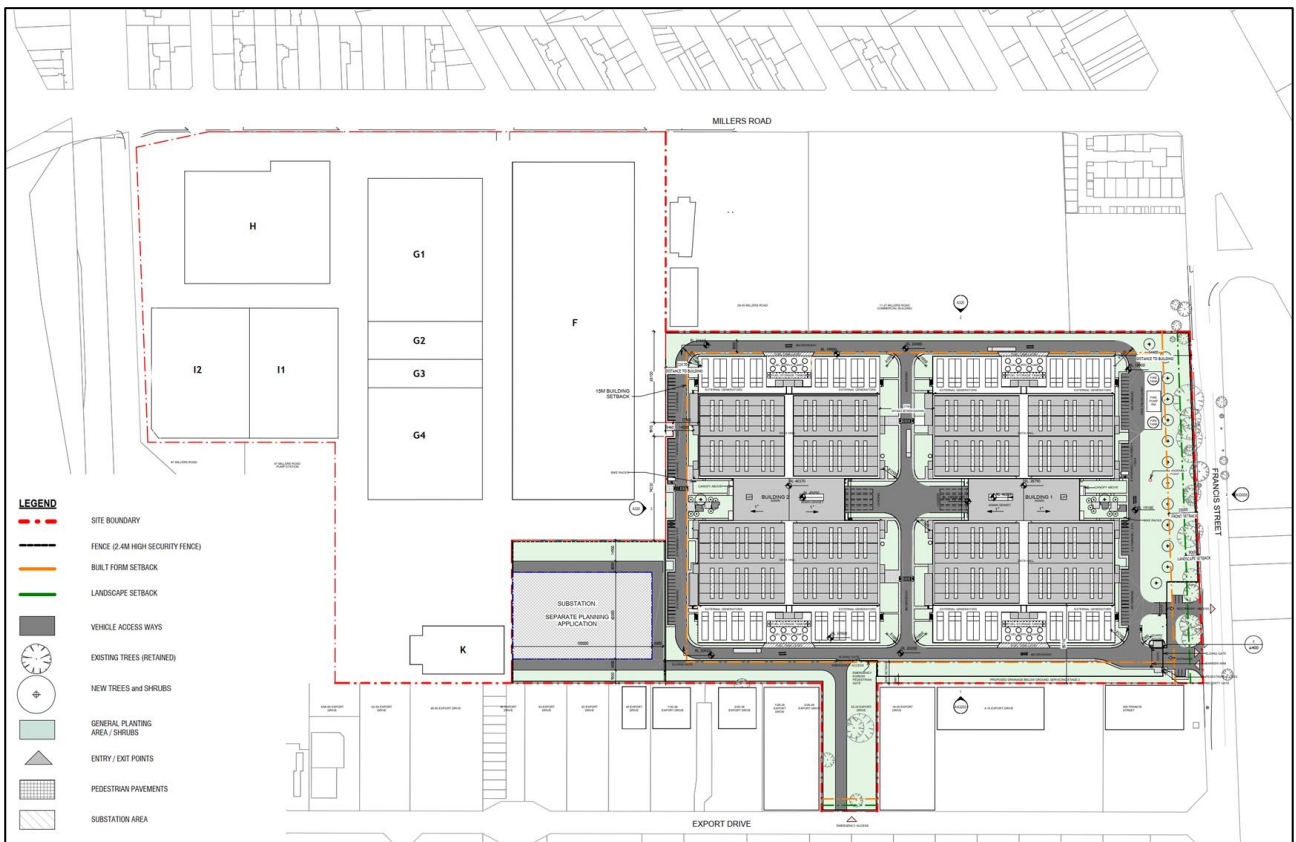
Draft site plan for the Project Stage 1<sup>1</sup>
